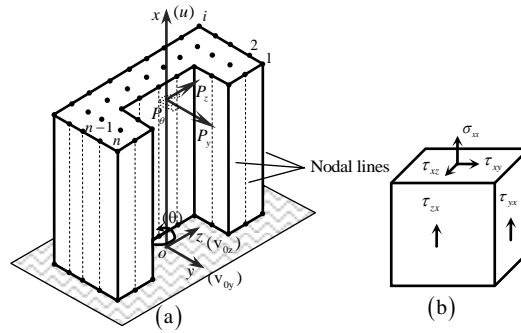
A CHANNEL-SECTION CANTILEVER BEAM
